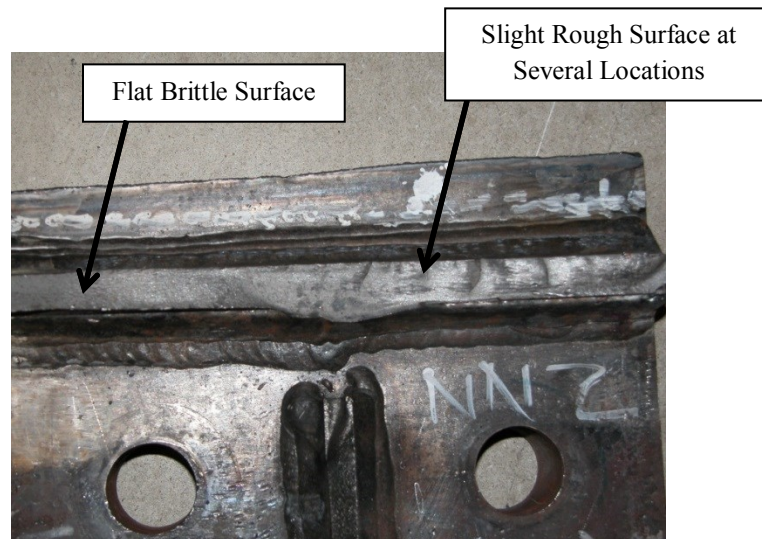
Fractured surface of side 1 of specimen N-N-2.
